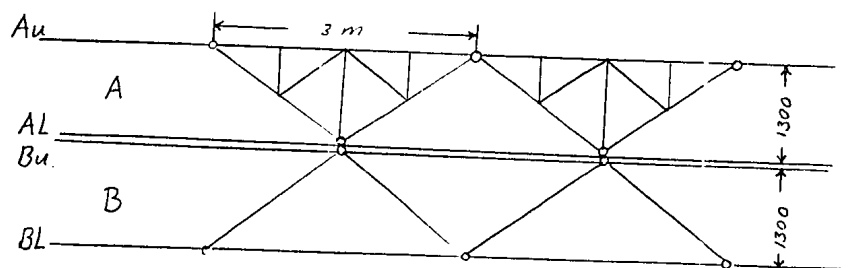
Design of Bracing of Longitudinal Beams (Truss Girders)
